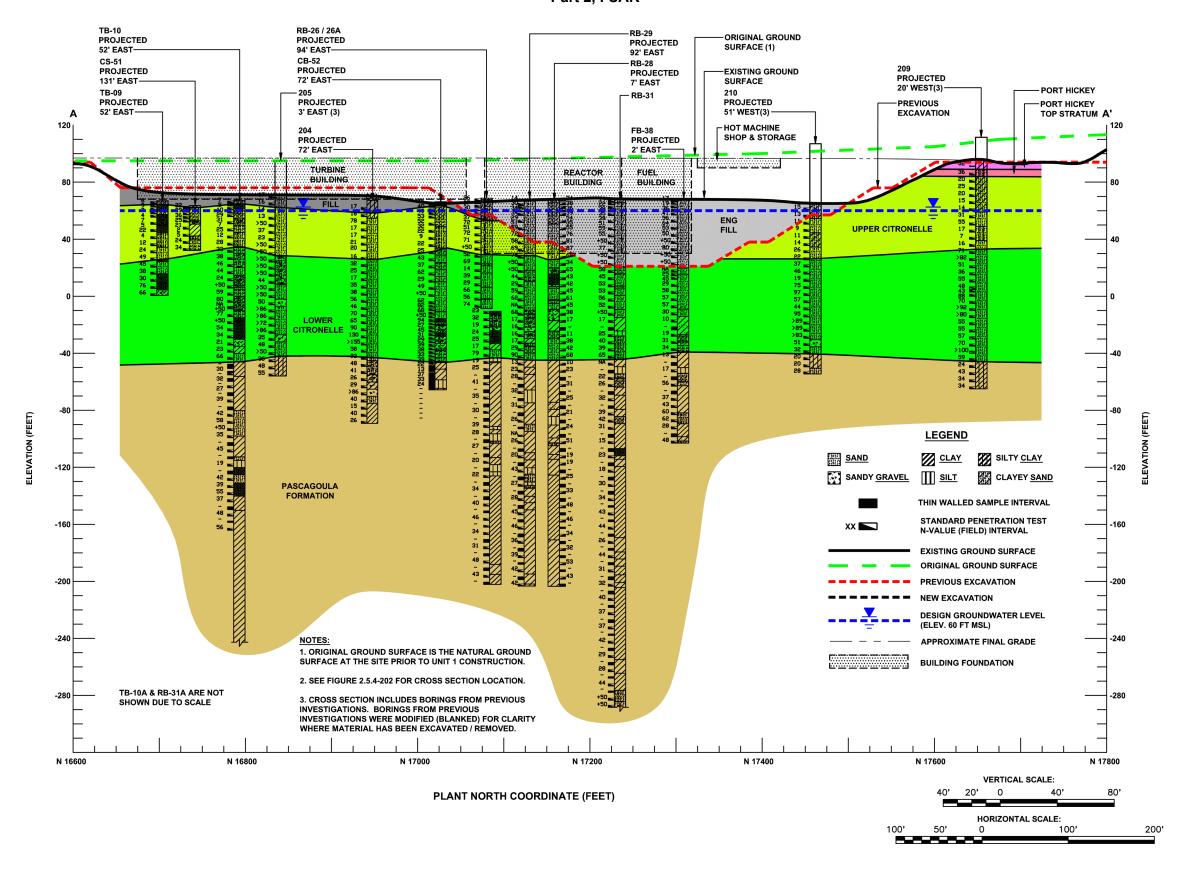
Cross Section A-A' Through RBS Unit 3 Site Location
